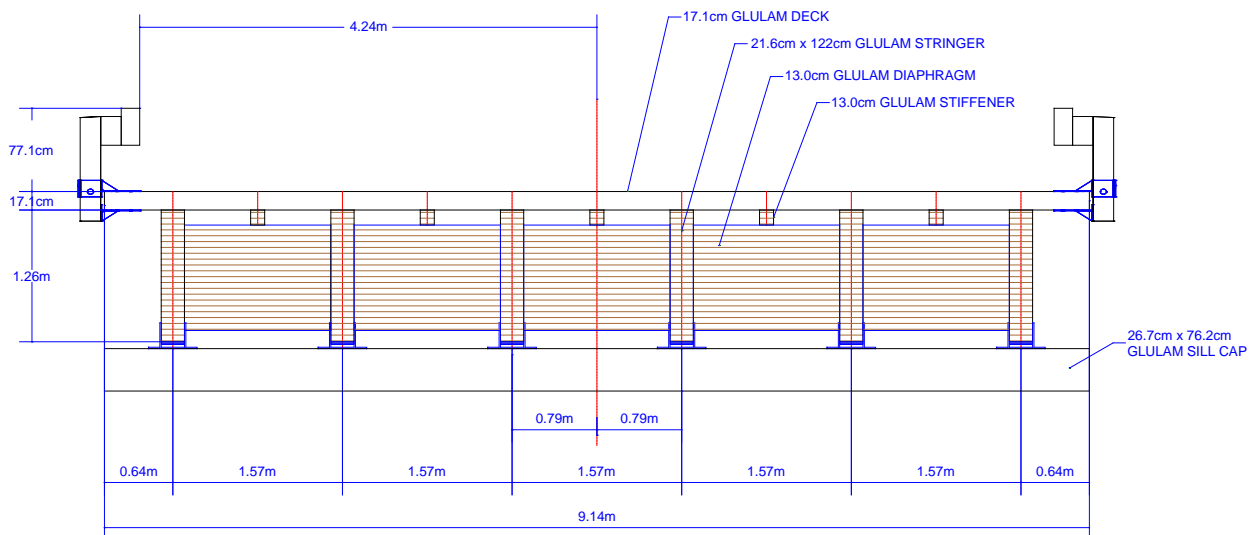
The bridge cross section showing the configuration of the girders, the deck, and the Test Level 2 crash-tested guardrail system
